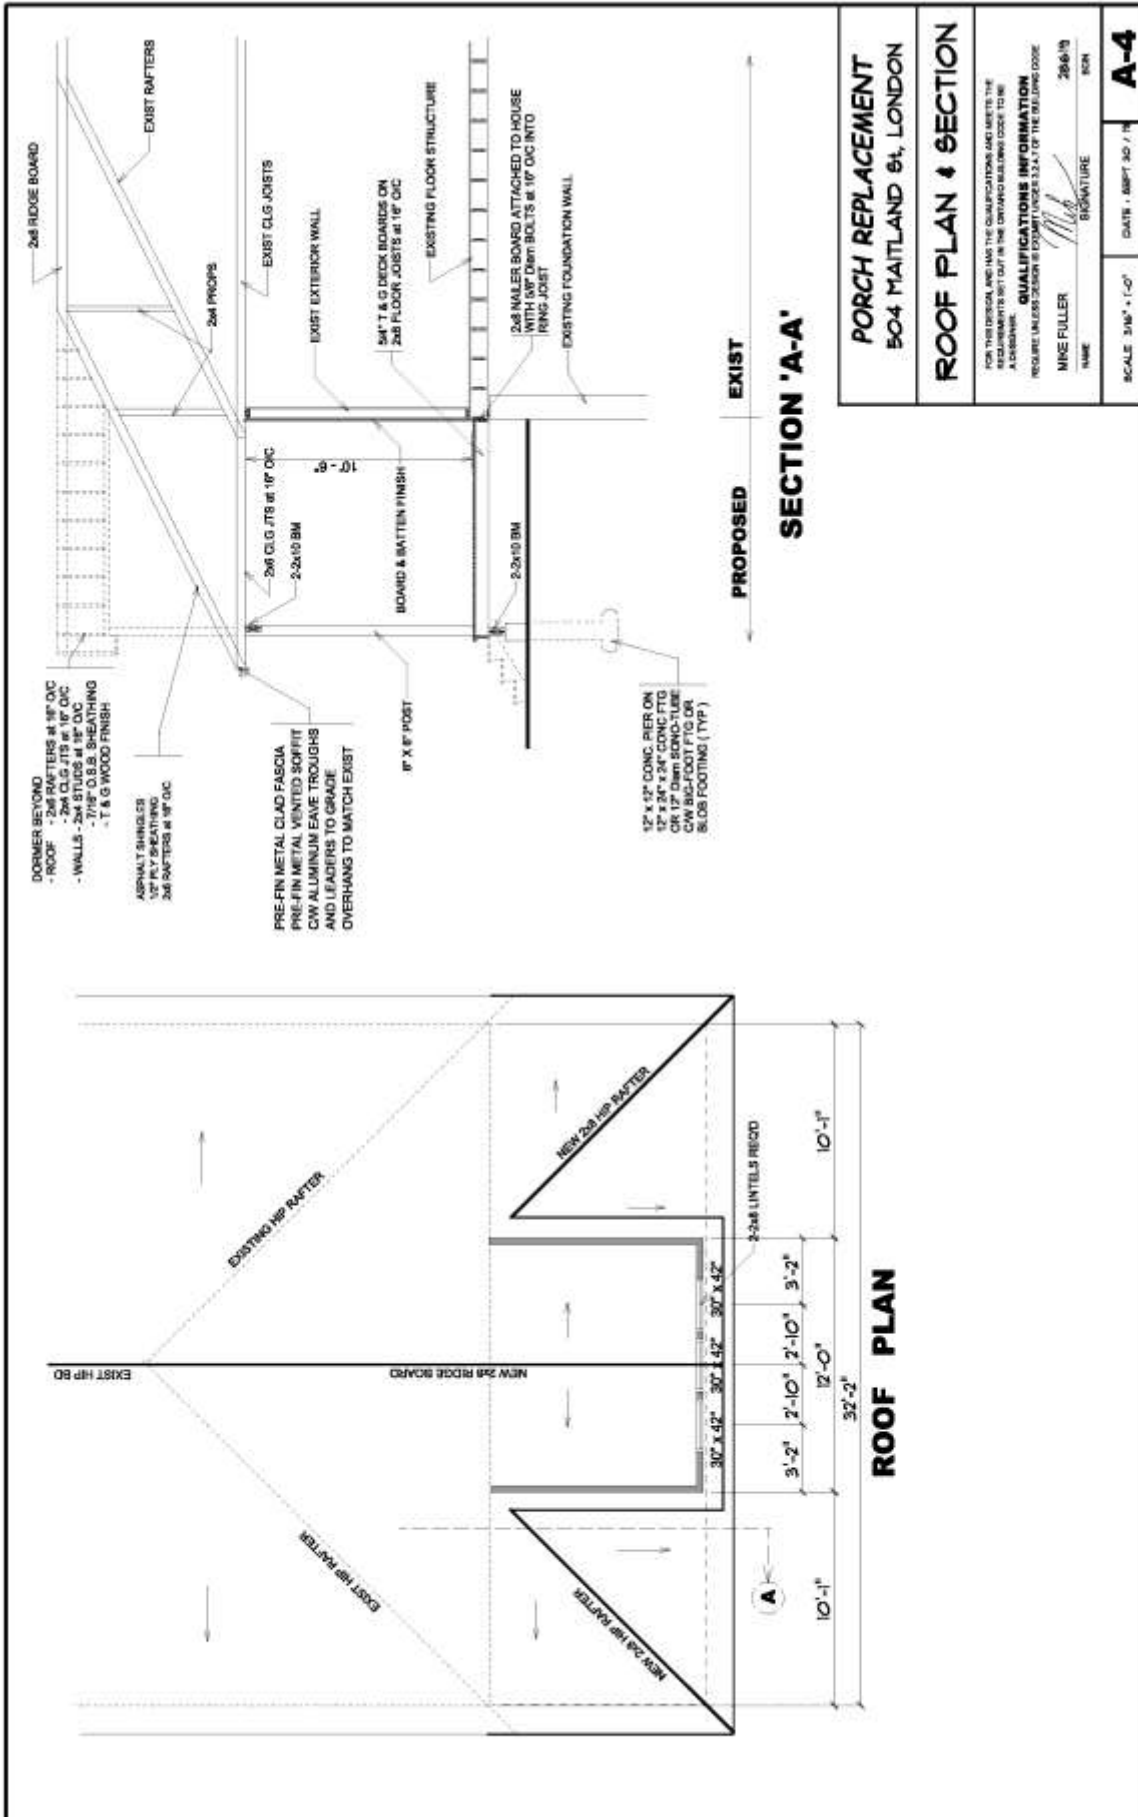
Roof plan and section showing the proposed porch alteration and proposed dormer for the existing semi-detached dwellings at 504-506 Maitland Street.
